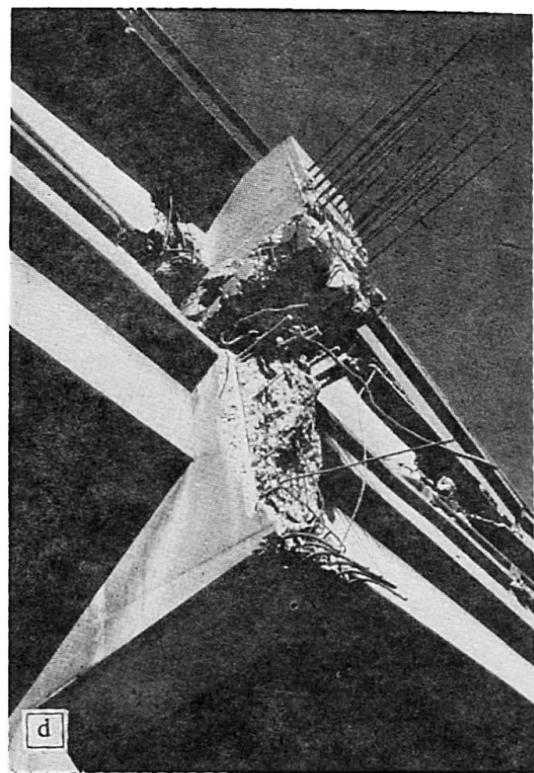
Bridge Damage During the 1989 Loma Prieta Earthquake
